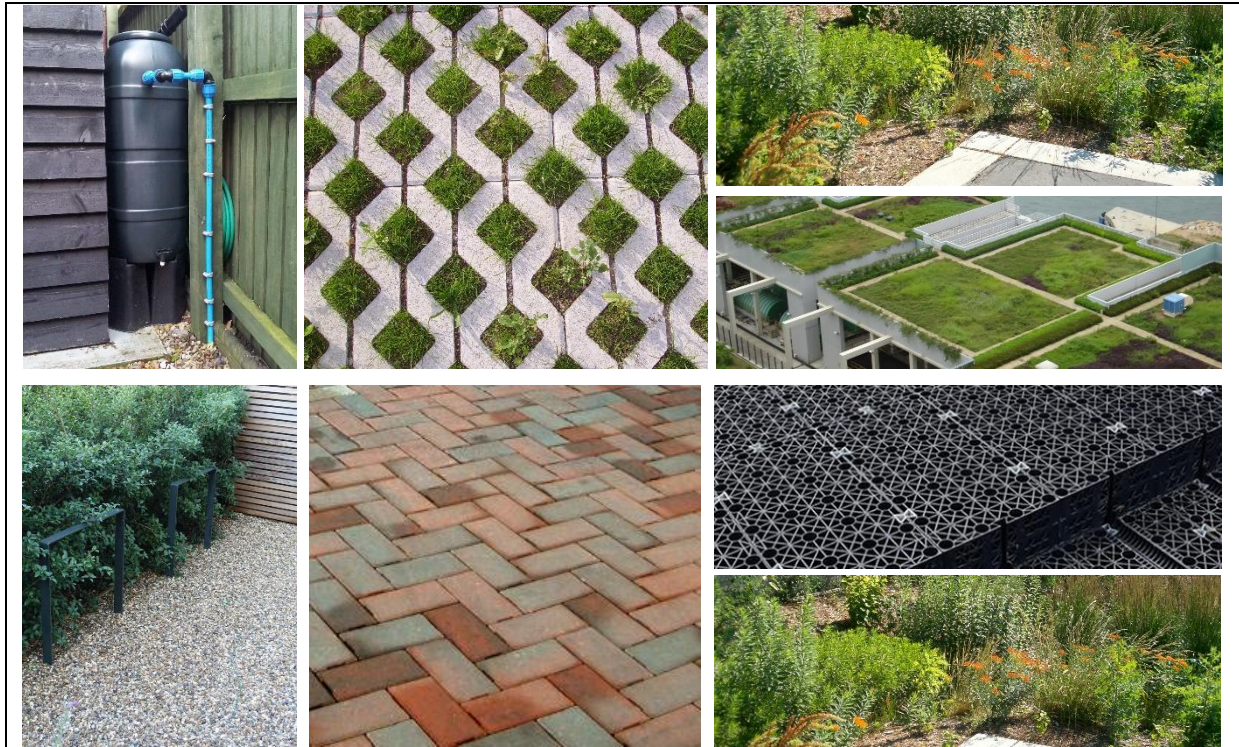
Surface water storage facilities and potential SuDS features - rainwater harvesting, on-site tank storage, rain garden soak-away and green roofs. (Source: UK SuDS Manual)
